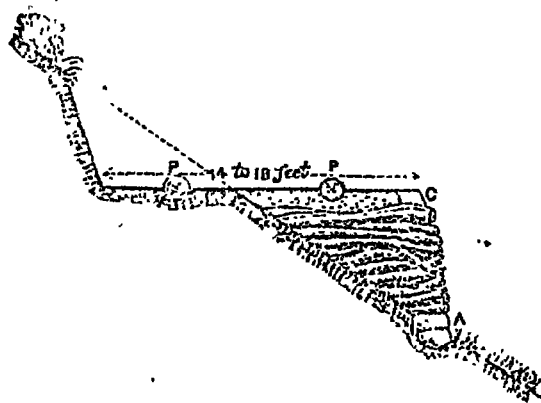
is a cross-section through a rolling road. A is the row of large stones which serves as a footing to the road. C is the stone coping placed along the outer edge of the road; P, P are the poles along which the logs are rolled. (Reduced from an illustration in the "Indian Forester," April 1889.)
